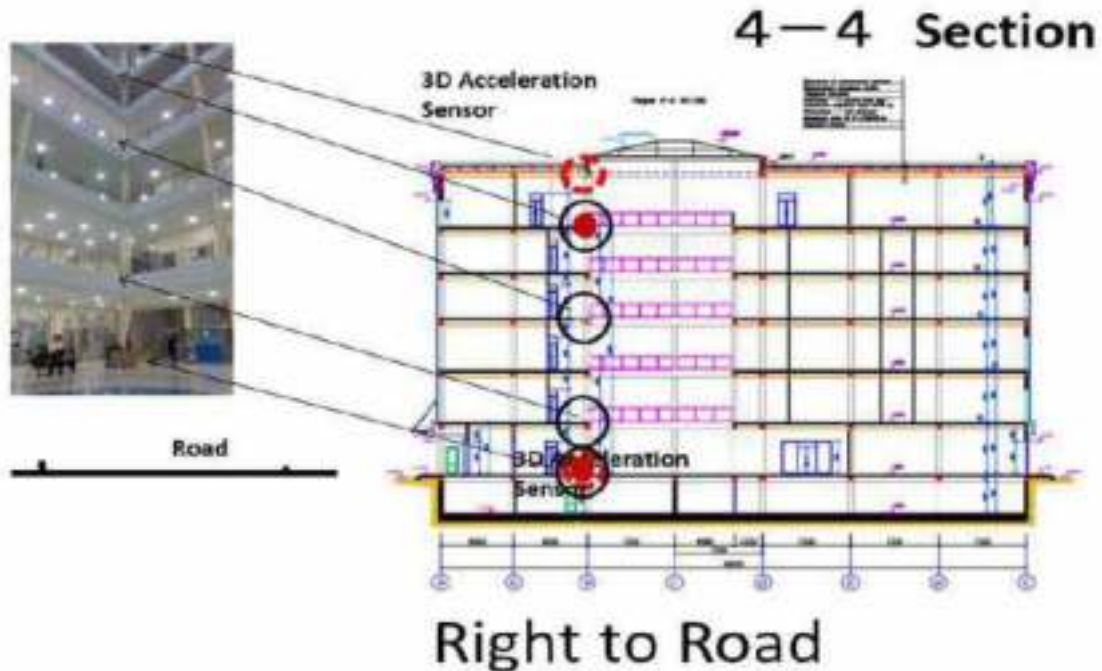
Section elevation (along 4-4 line) of main building and accelerometer position in first, second, third measurement
